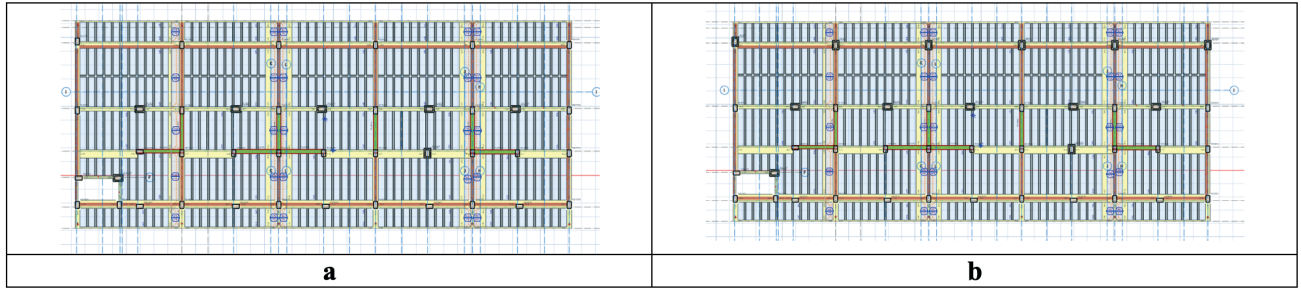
Hybrid Models 1 and 2 – Residential unit’s entrance floor of the ProtaStructure model a. Shear walls and column jacketing are added, façades remain unaltered. b. Shear walls and column jacketing are added including the columns on the façade (Images are produced via ProtaStructure Software).
